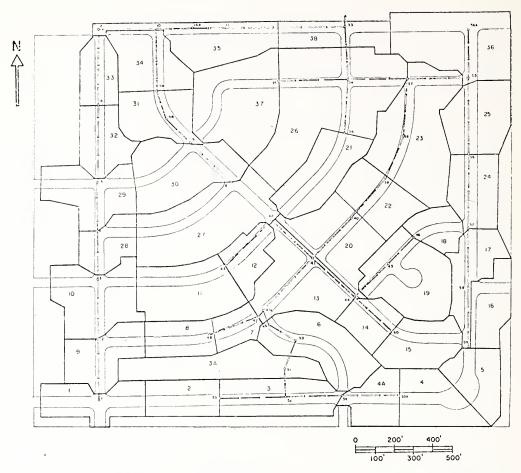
Drainage Subbasins and Storm Sewer Layout of Bar Barry Heights.
